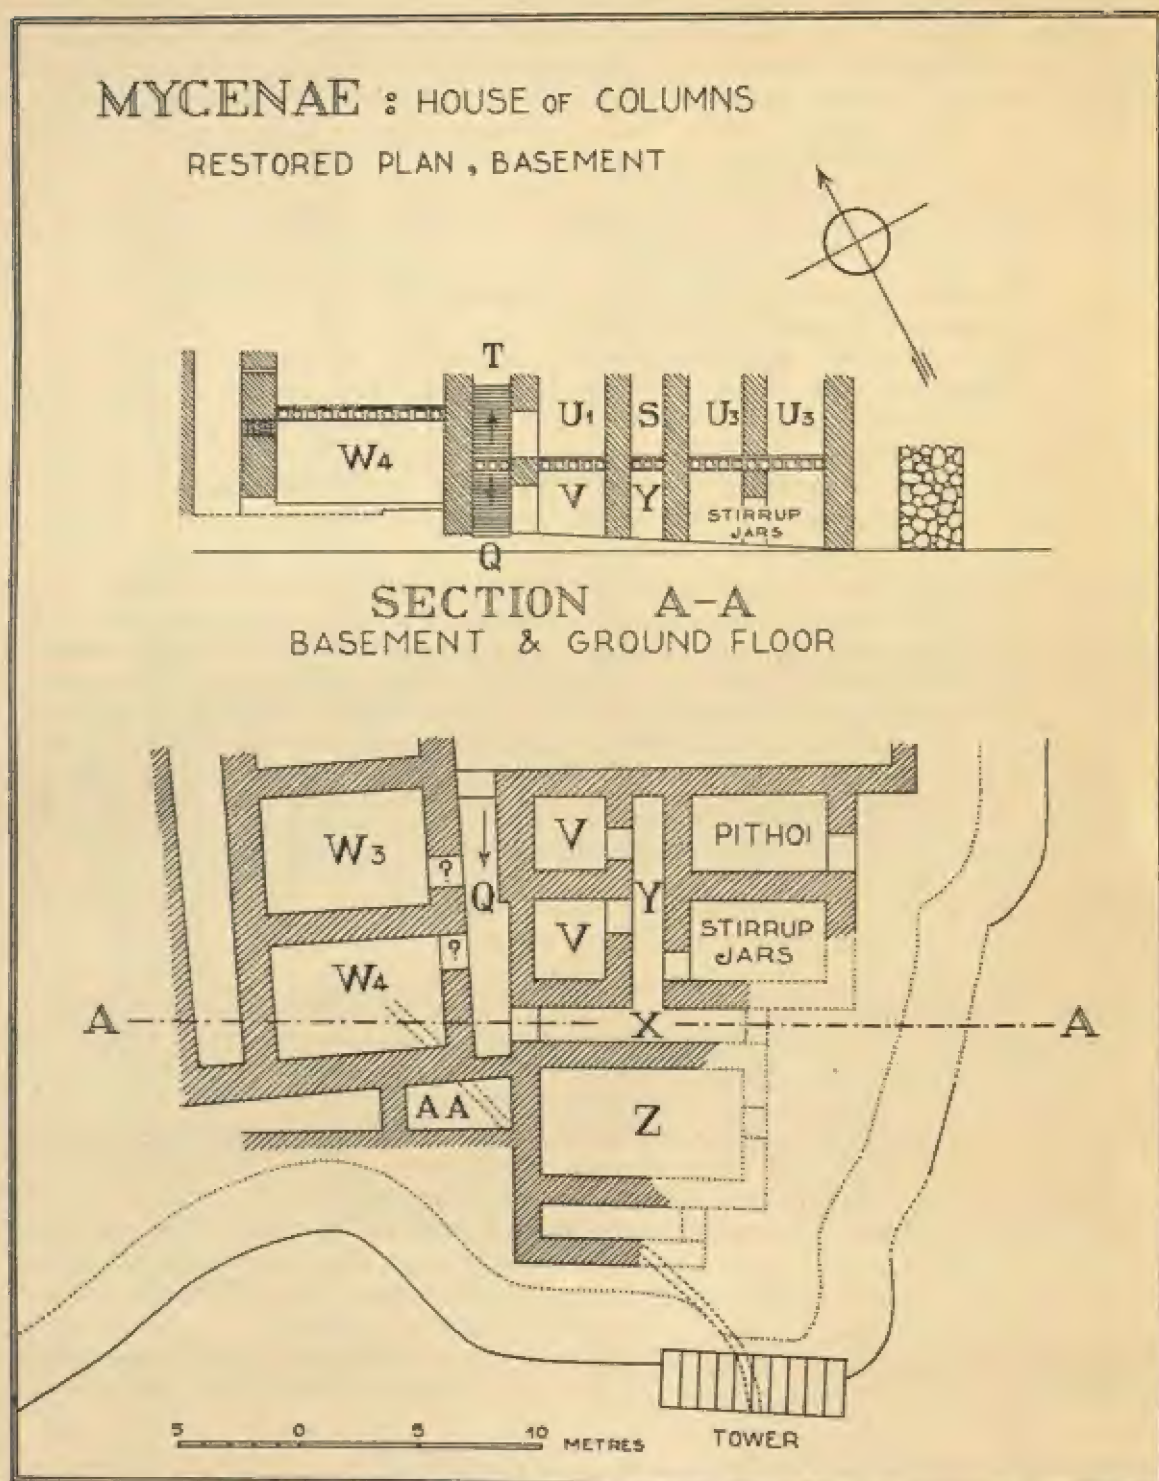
HOUSE OF COLUMNS, MYCENAE, BASEMENT. RESTORED PLAN AND SECTION.
